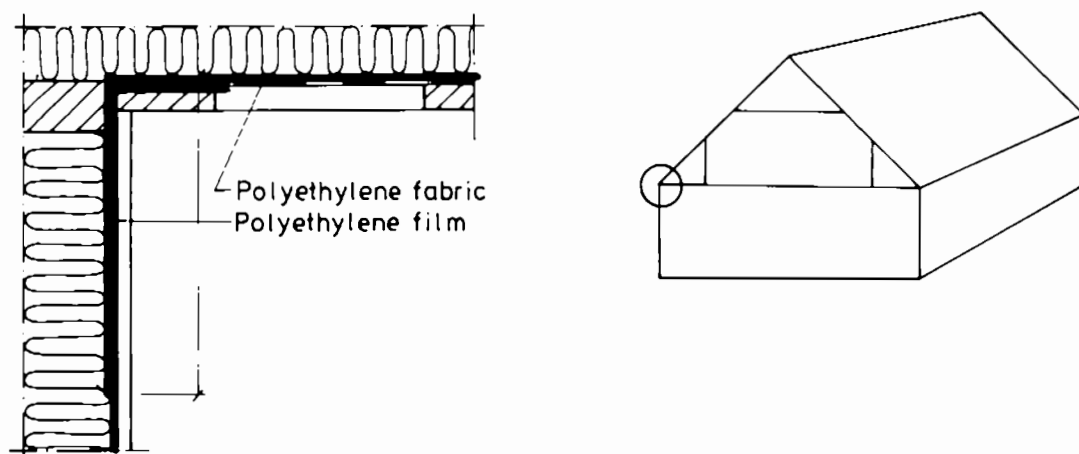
Detail B – Joint between load-bearing inner wall – floor construction.
